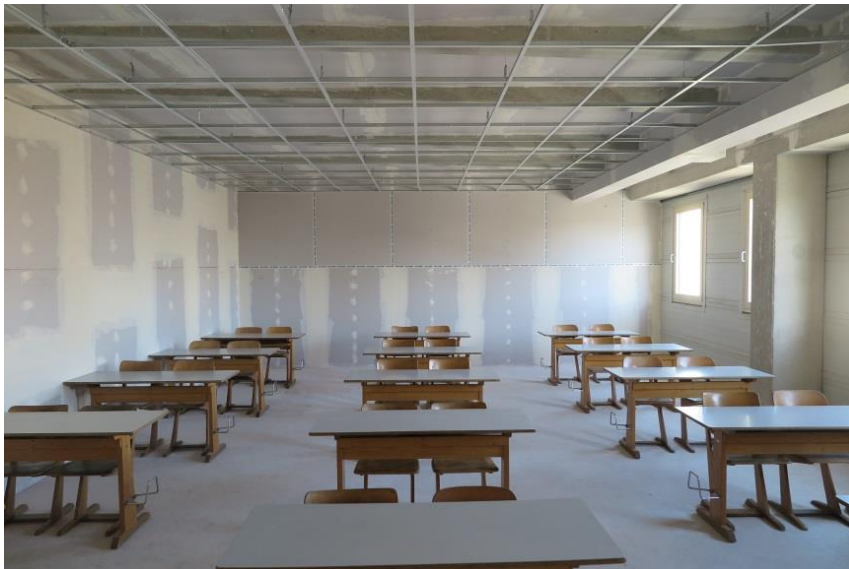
Room in unfinished state with installed ceiling grid and classroom furniture
